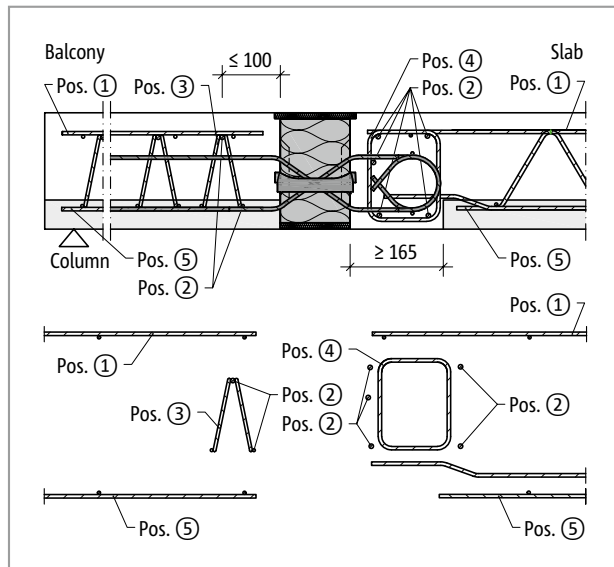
Schöck Isokorb® XT type Q-VV1 to VV4 on-site reinforcement with lattice beam
